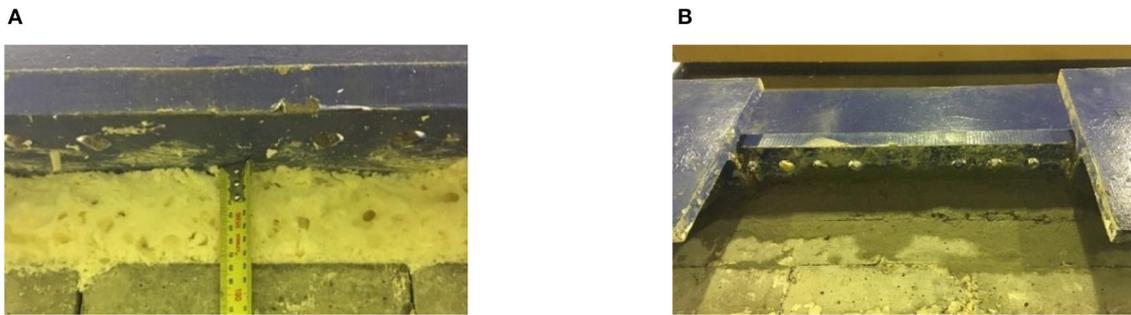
| (A) Top panel–Steel beam interface joint filled with self-expanding polyurethane foam (MF). (B) Top panel–Steel beam interface joint filled with grout (MG).
